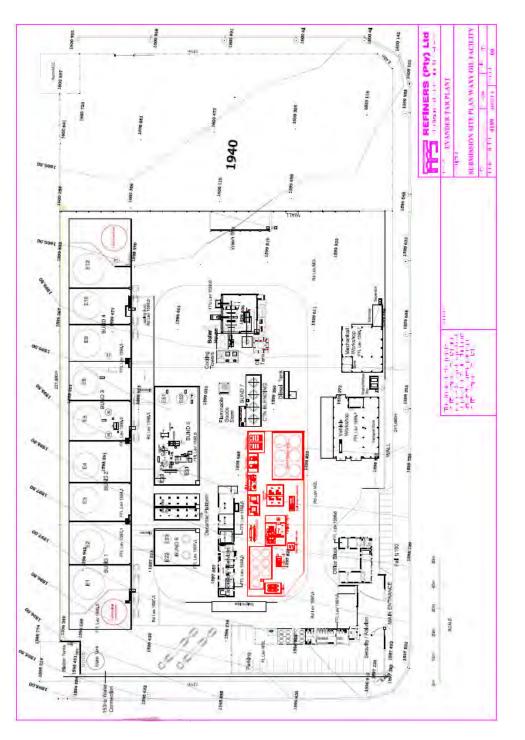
Site Layout Showing the Proposed new Facilities in Red
